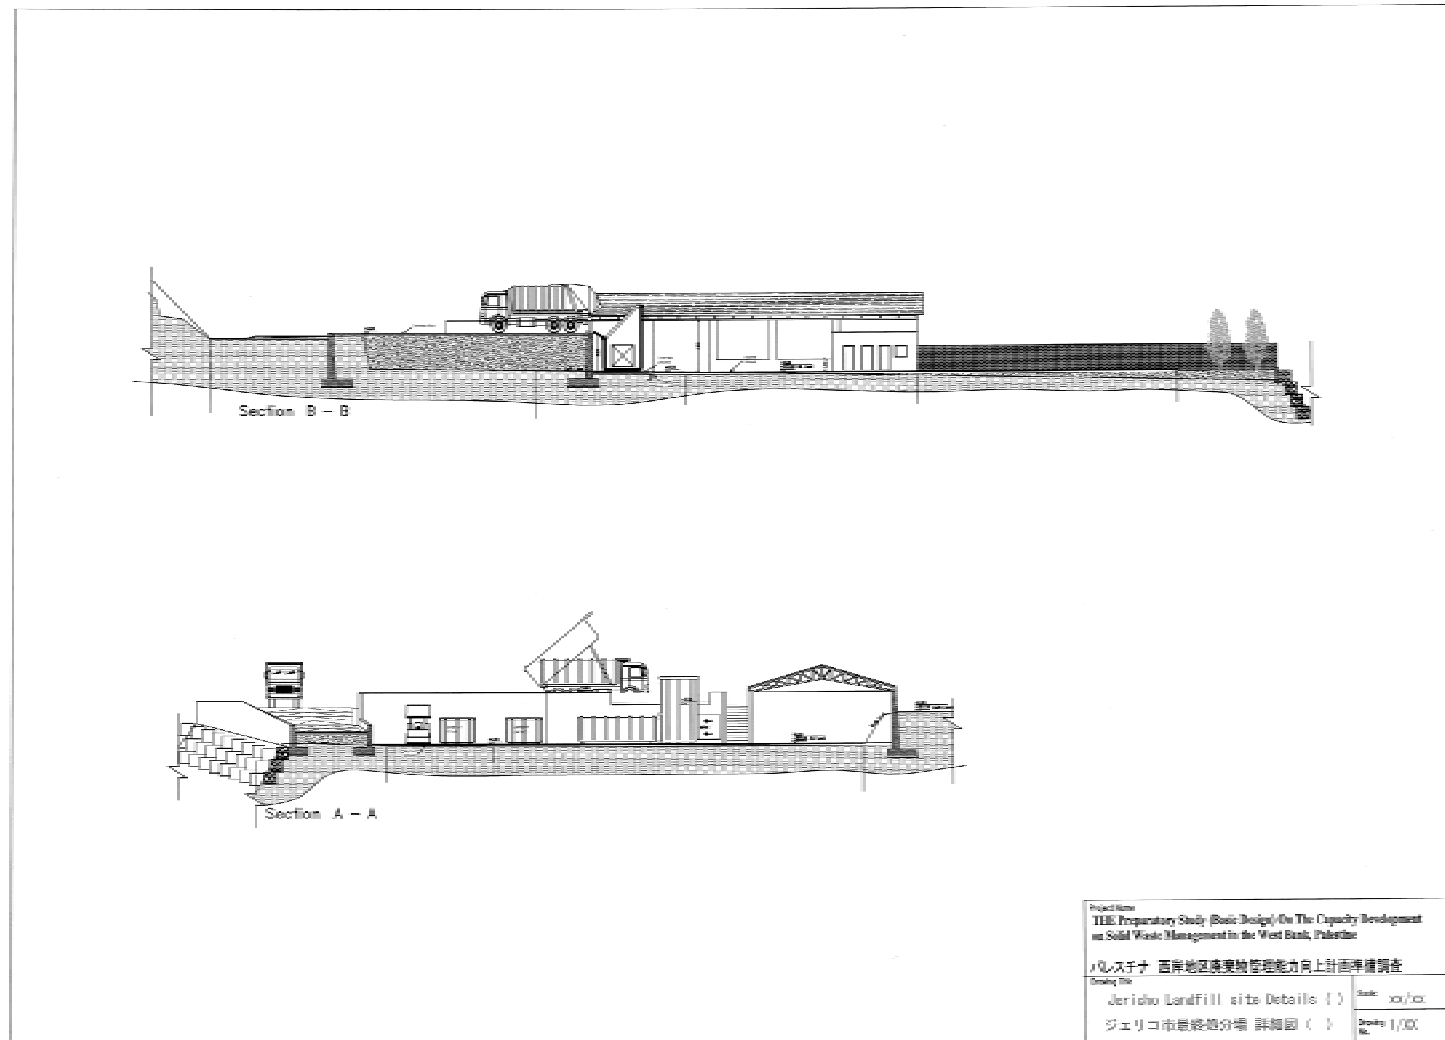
Cross Section Plan of Waste Transfer Station and MRF in Jericho
